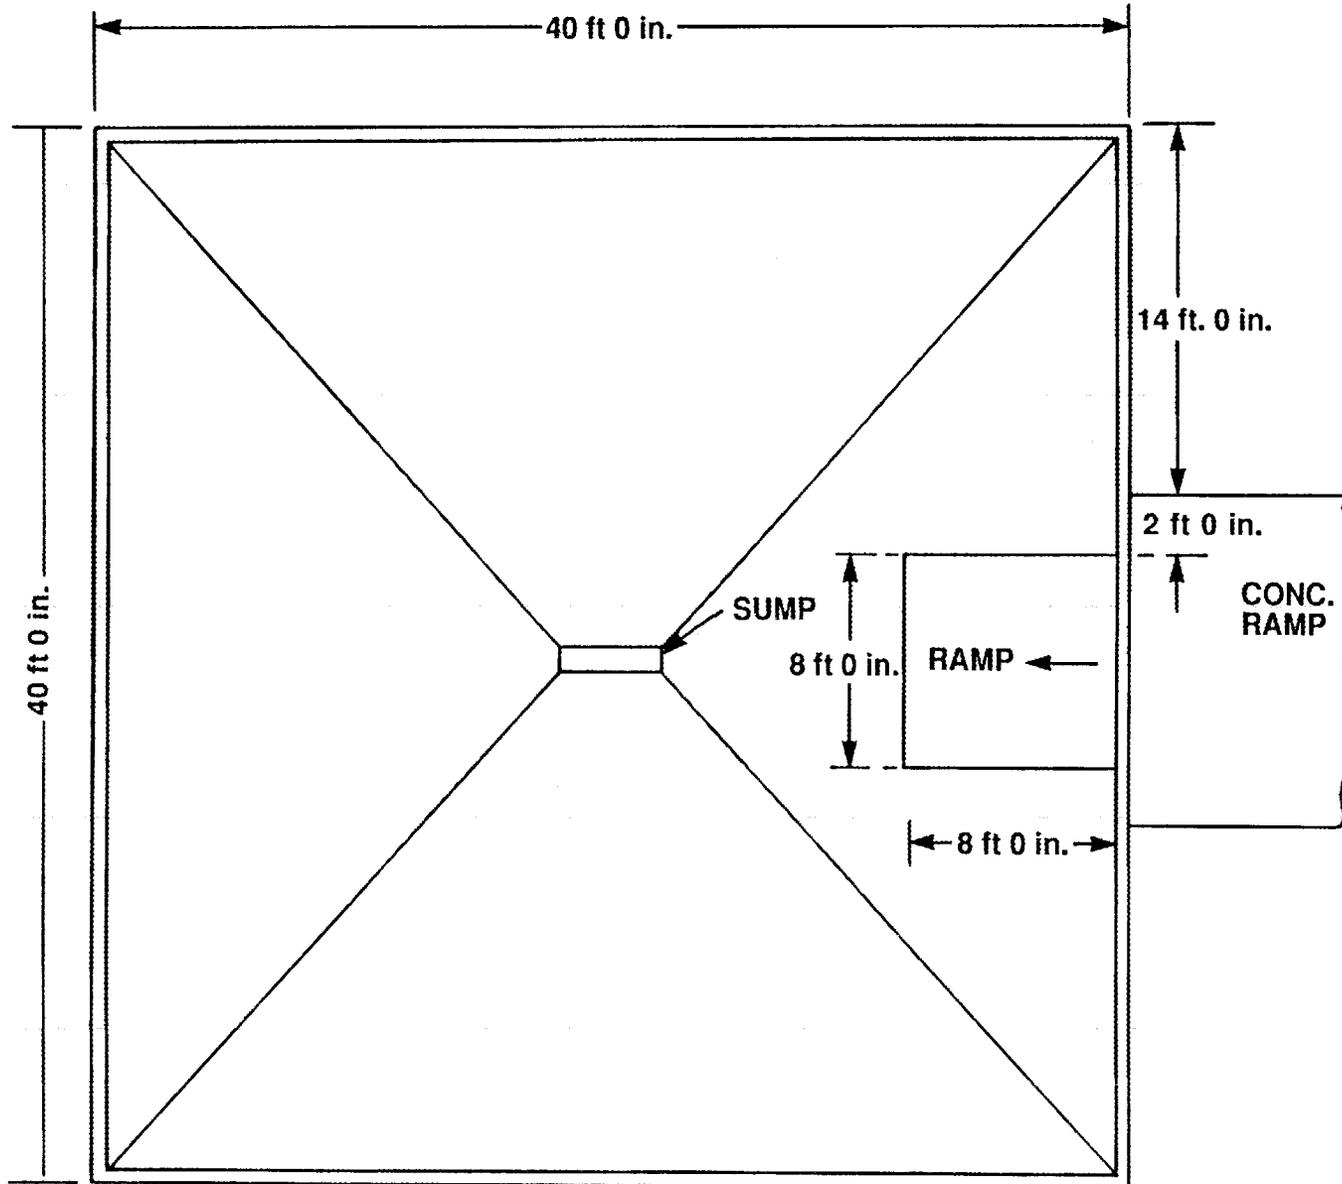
Layout of Facility 7507W, Mixed Hazardous Waste Storage Pad.
